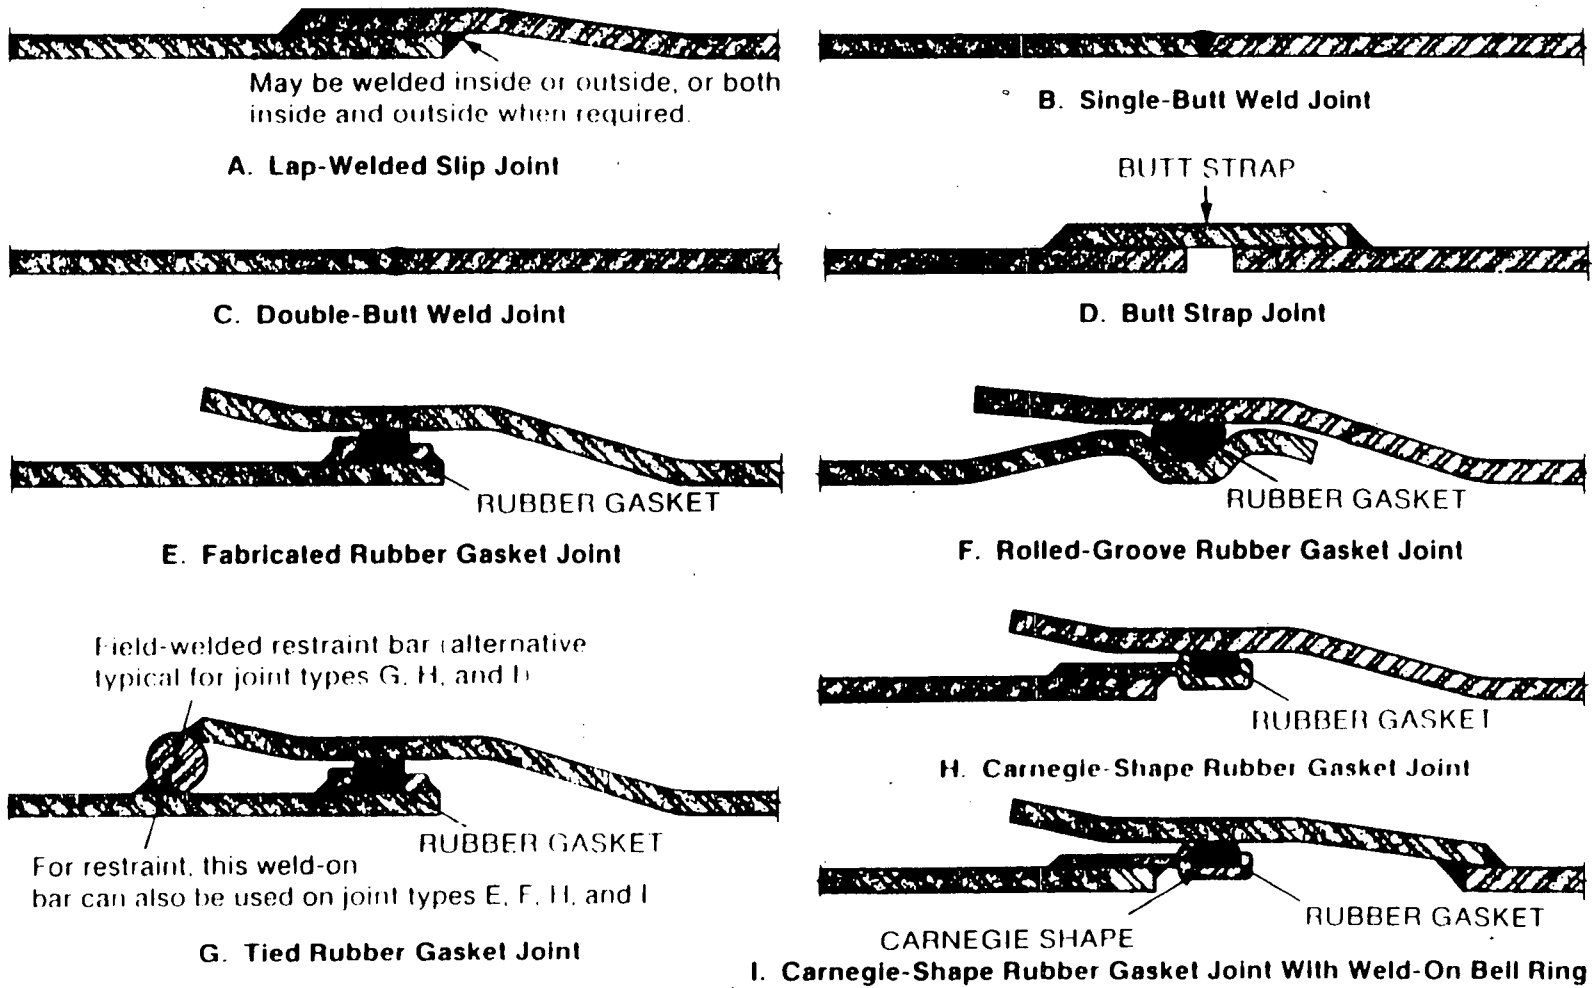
Welded and Rubber-Gasketed Field Joints
